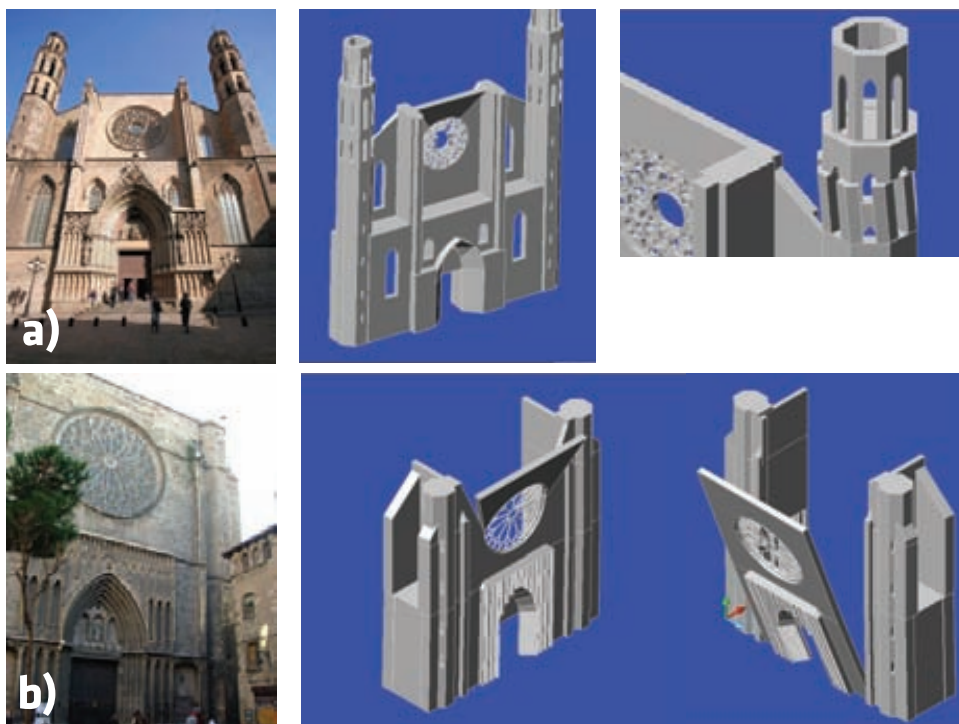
(a): Santa Maria del Mar's façade with reconstructed spandrel wall over rose window and upper body of left tower, and corresponding collapsing mechanisms. (b): Santa Maria del Pi's façade, also with reconstructed spandrel over rose window, and weakest collapsing mechanisms identified.
